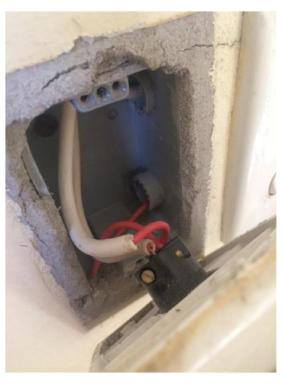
Cell Block Wall Construction and Typical State of Newer Wiring
